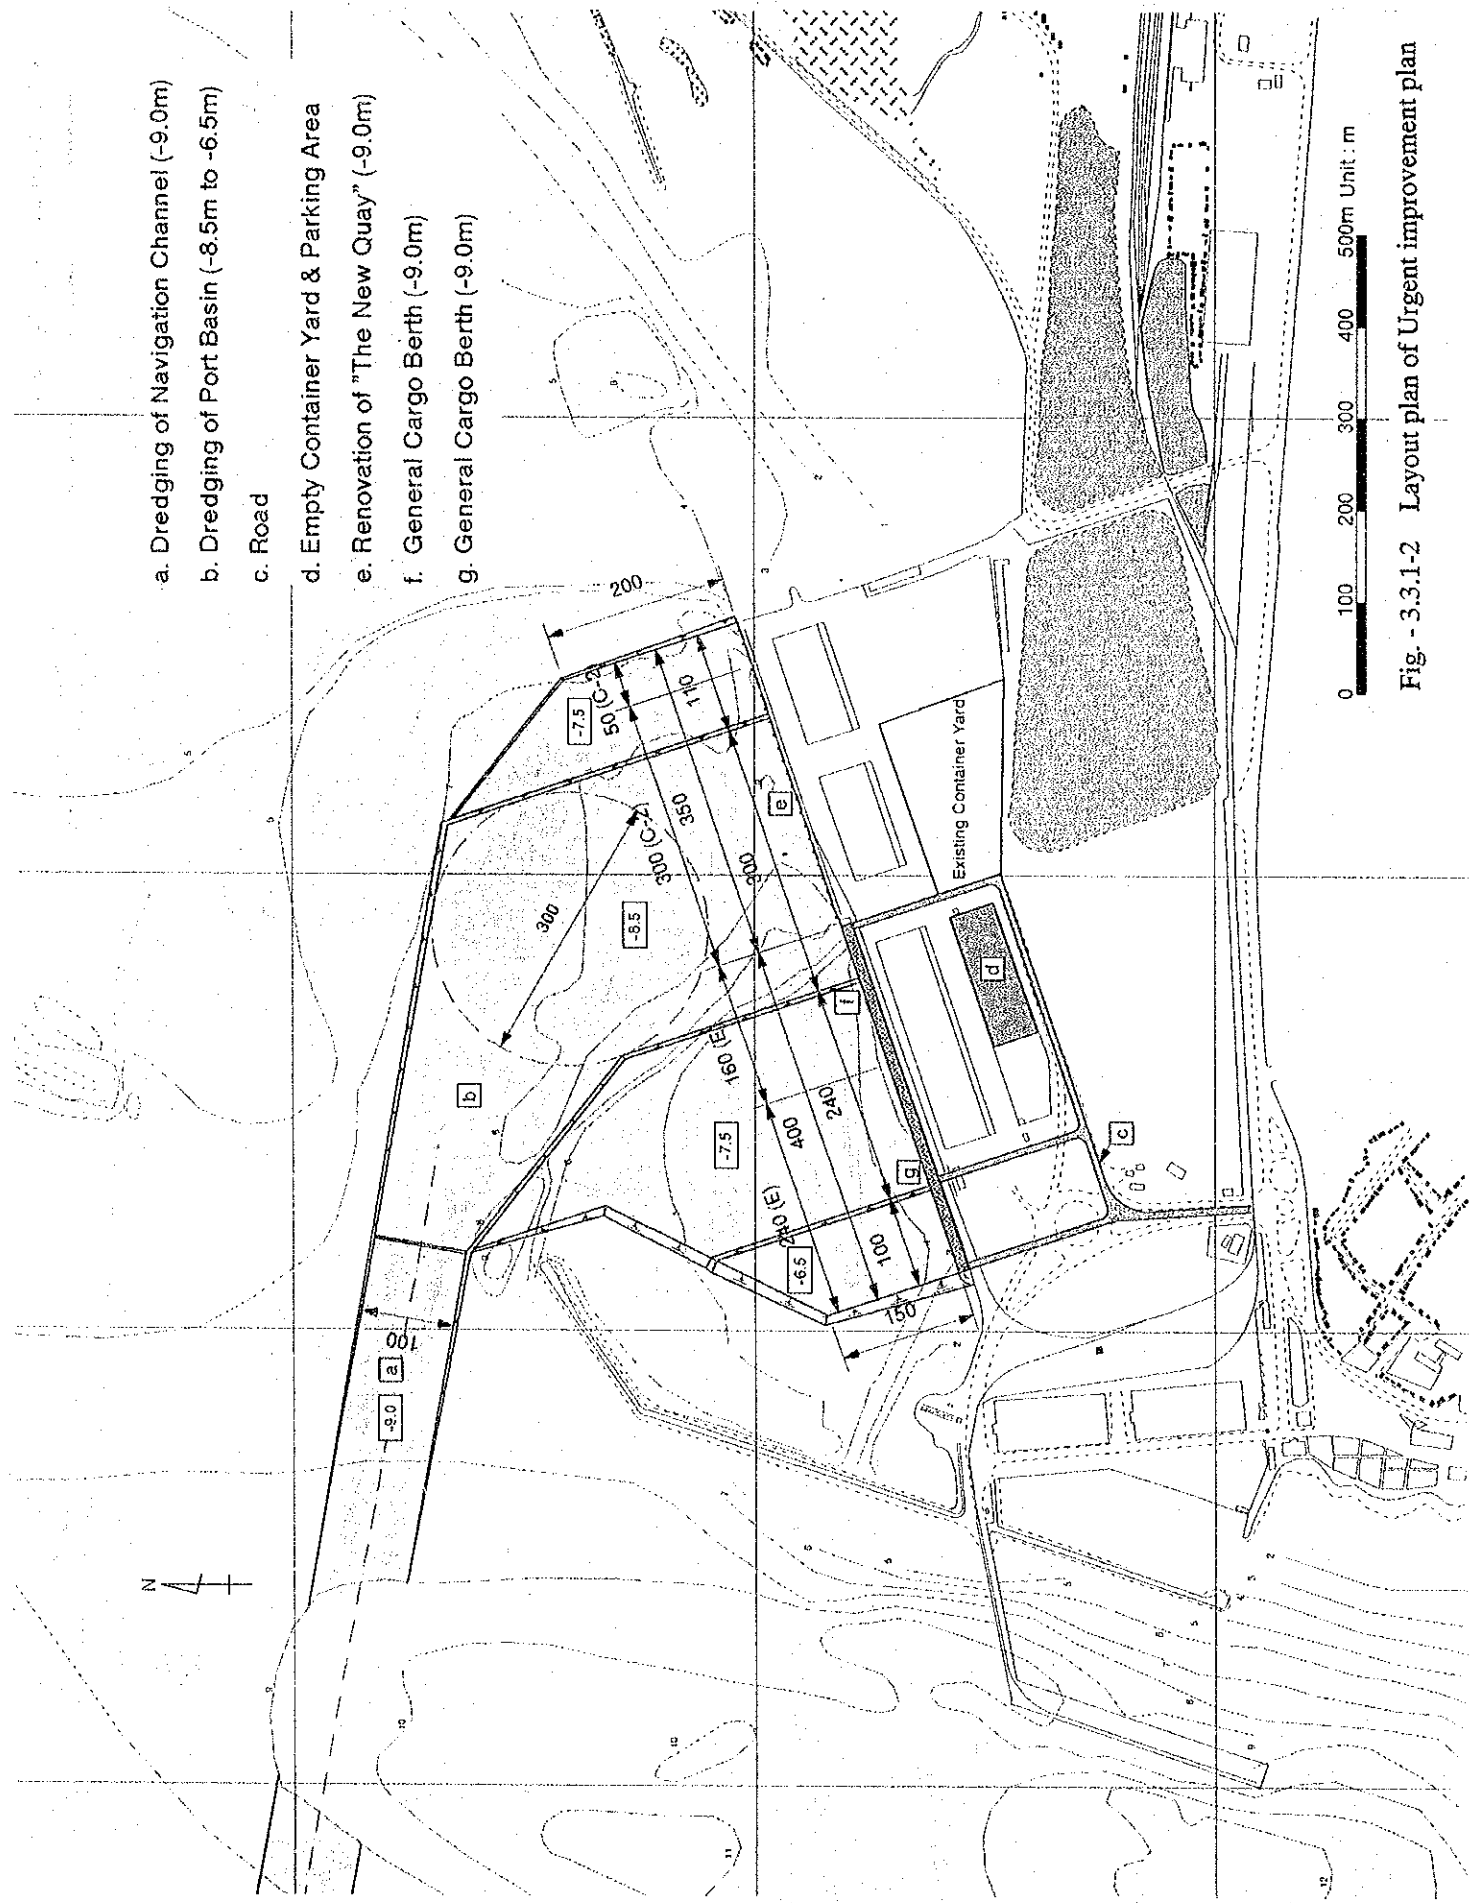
Layout plan of Urgent improvement plan
